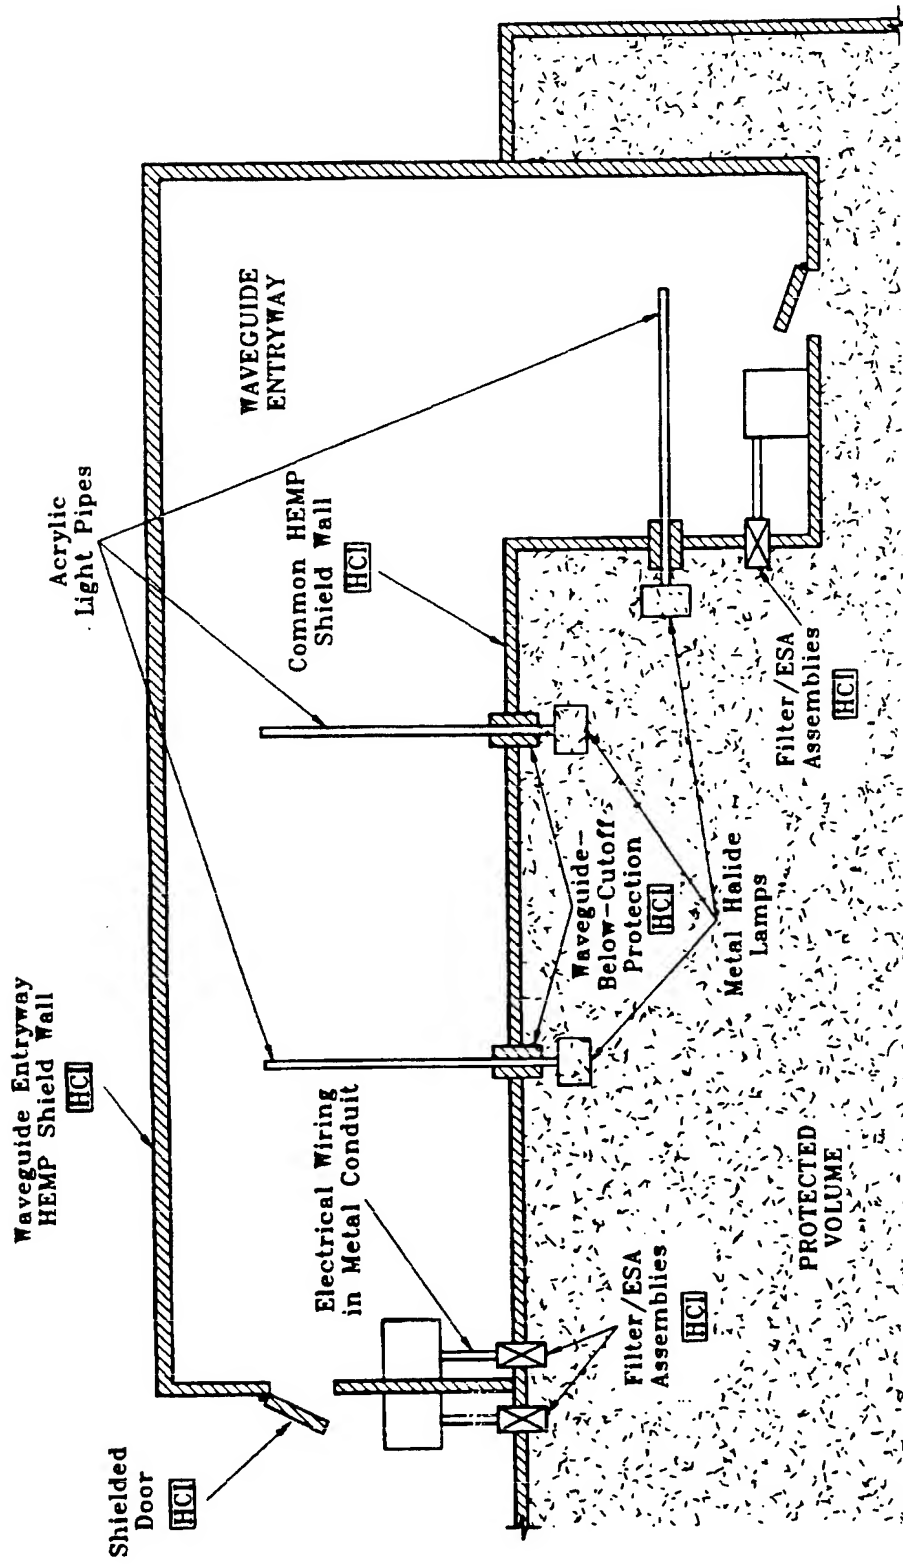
A lighting concept providing light transmission through acrylic tubes.
